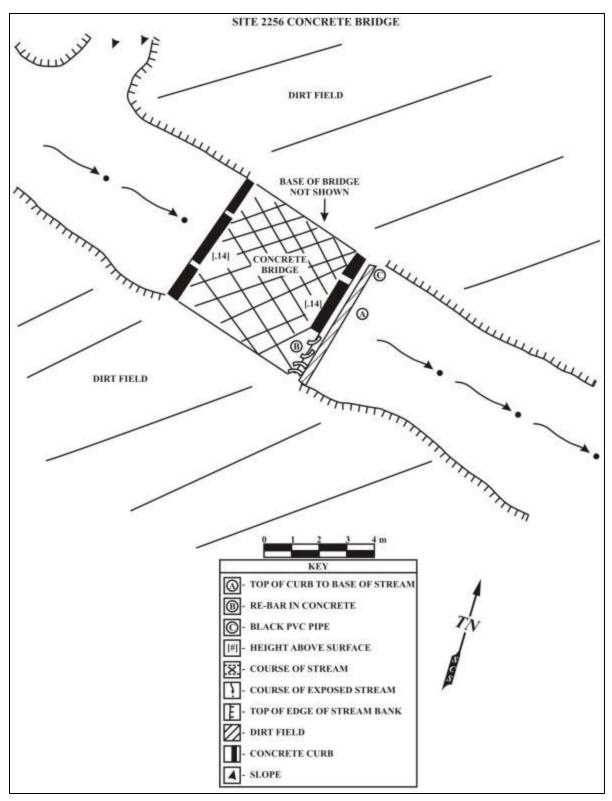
Plan view of Site -2256 bridge concrete deck and floor.
